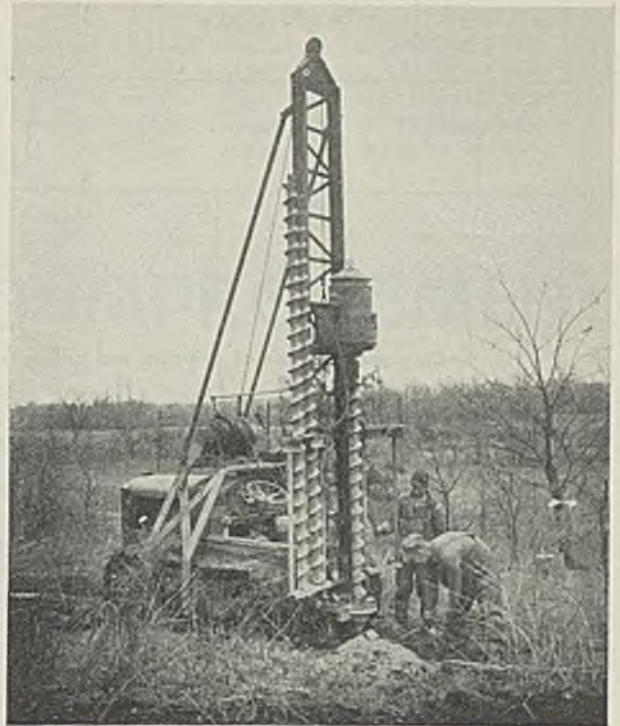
Late-type tractor-mounted auger drill used at Delta
